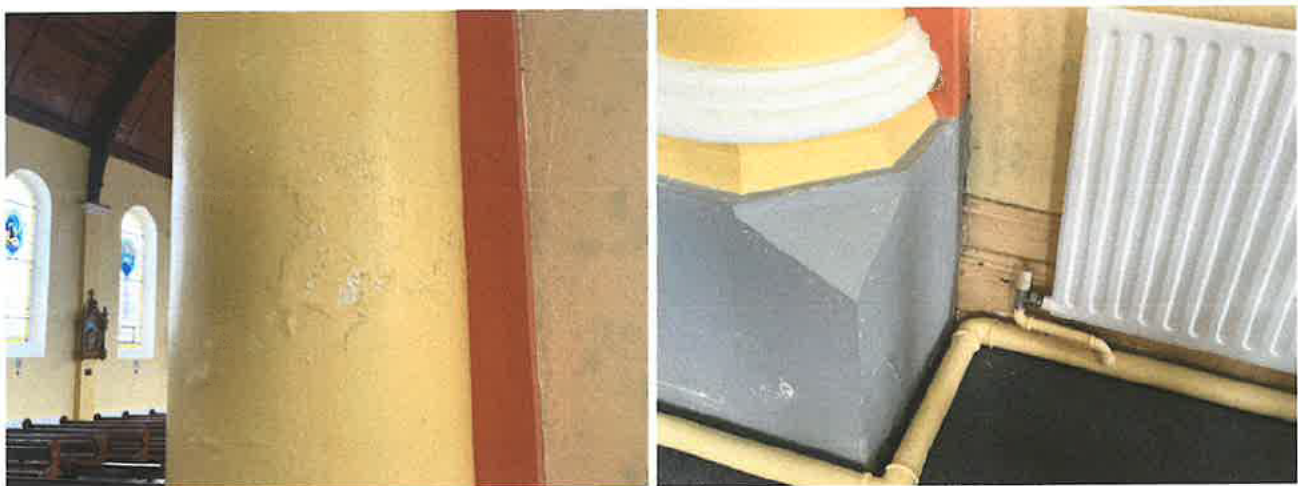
; Evidence of water ingress damage to column pilaster at junction of nave and west wall of north transept. Photo 32; Evidence of water ingress damage wall and skirting at junction of nave and west wall of north transept.
